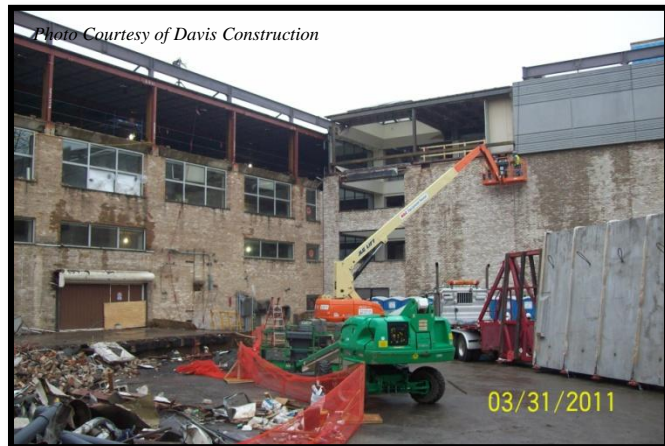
| Demolition of Existing Parapet for Perimeter of Main Building
